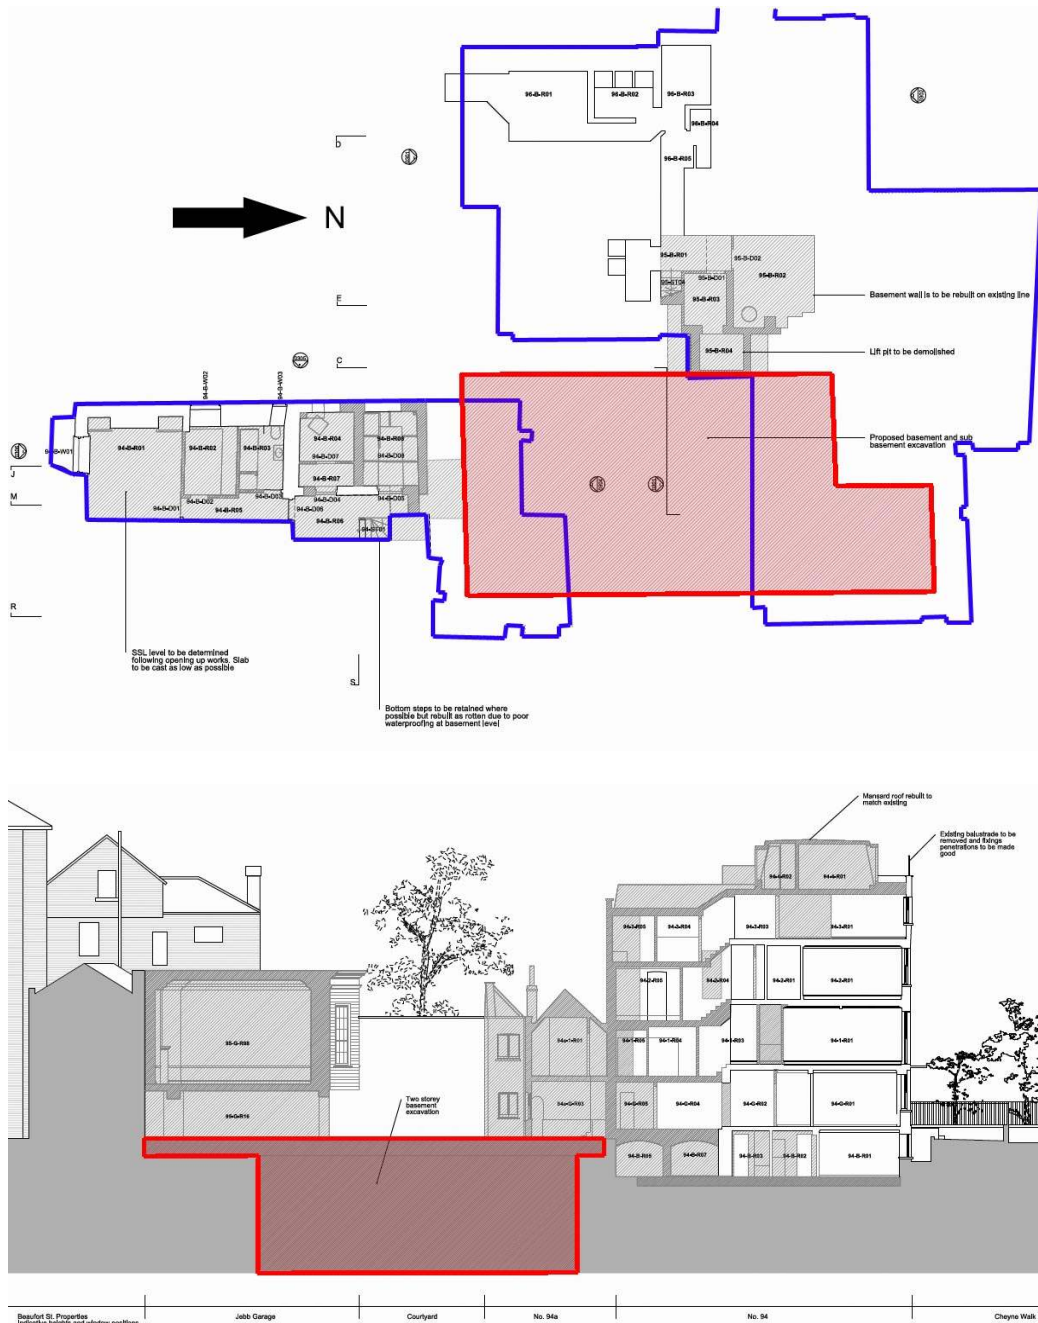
Plan, and N-S section depicting the proposed basement in red, and existing property footprint in blue, adapted from drawings provided by 6a Architects
